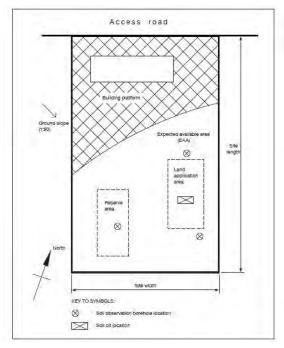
Generalised site plan for a single lot (AS/AZS 1547: 2012)
